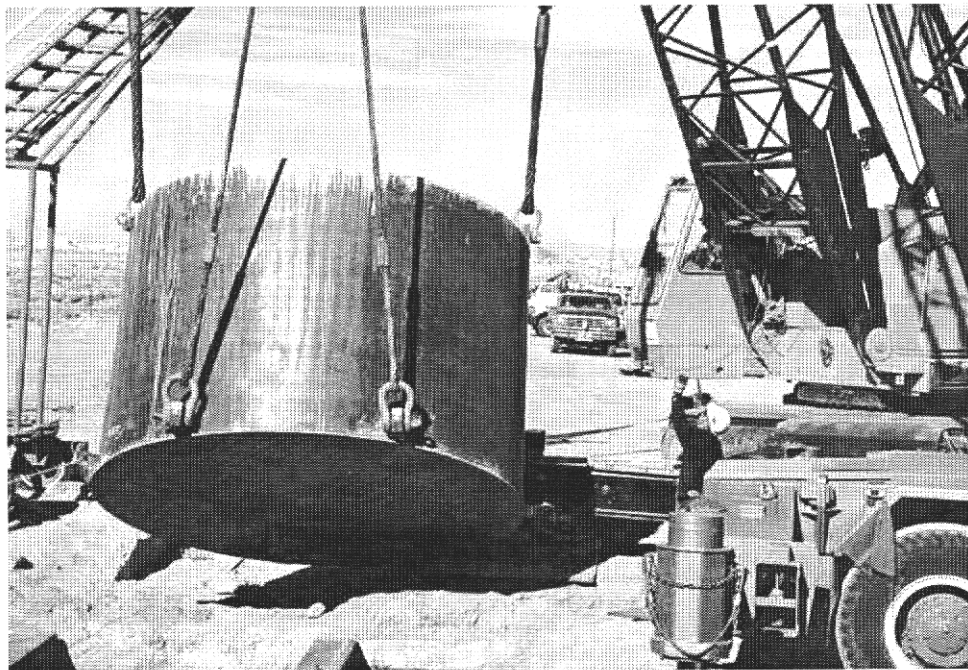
PMATP-SO1 Target Roller Bearings.
